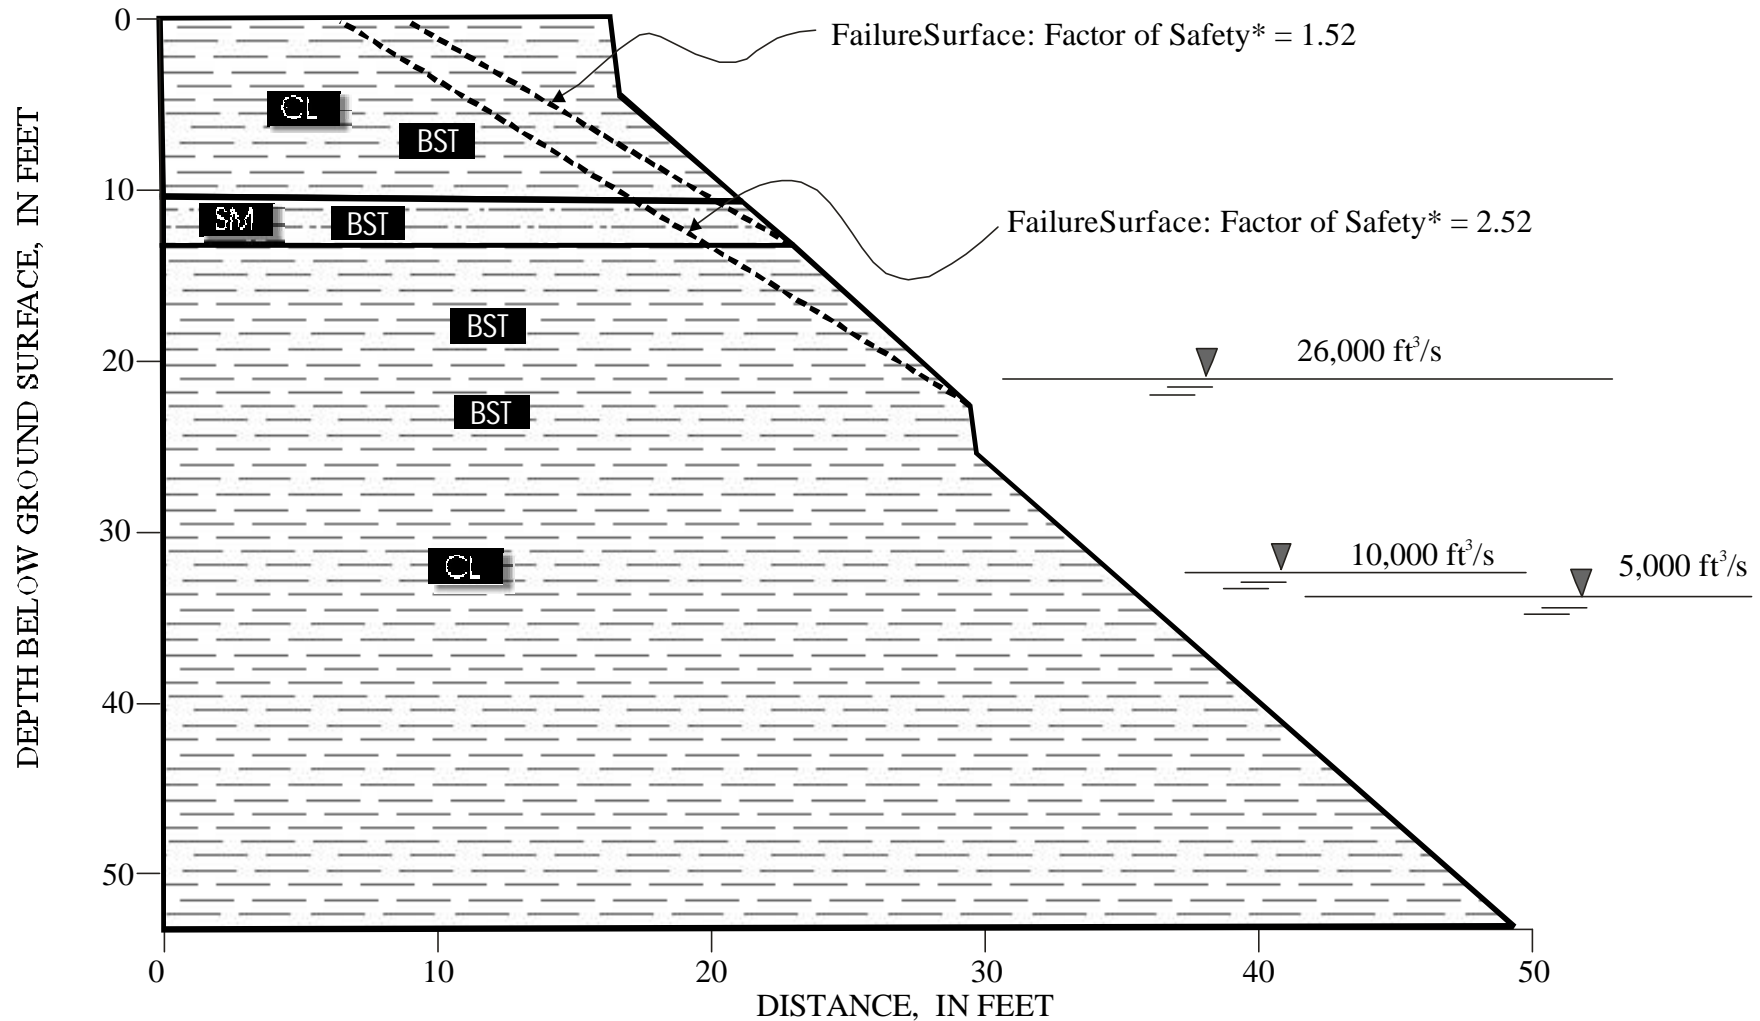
Idealized bank section at River Mile 1682 (McRae) showing the modeled, planar critical failure-surface, factor of safety (F_s), river stage and groundwater levels, location of BST tests, and differentiated soil units.
